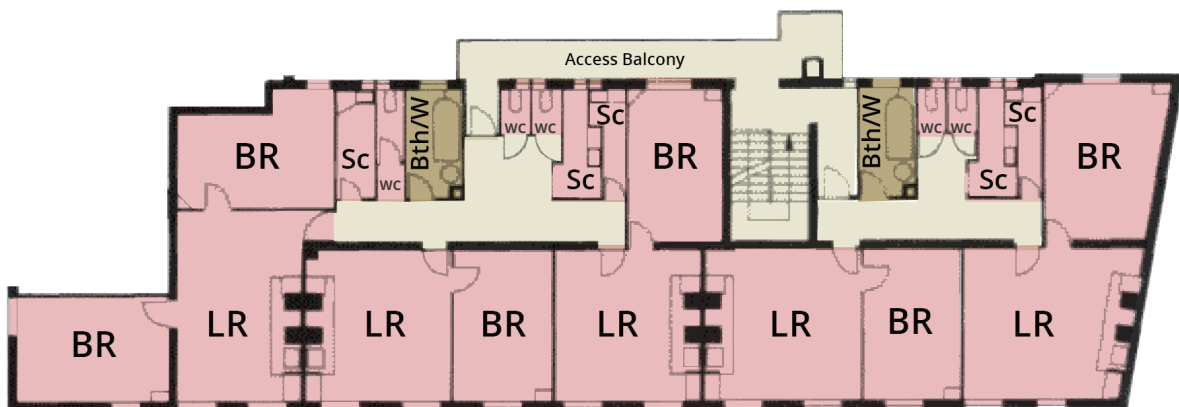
Part of the first-floor plan of Birchfield House (1926-27) scale 1:200
